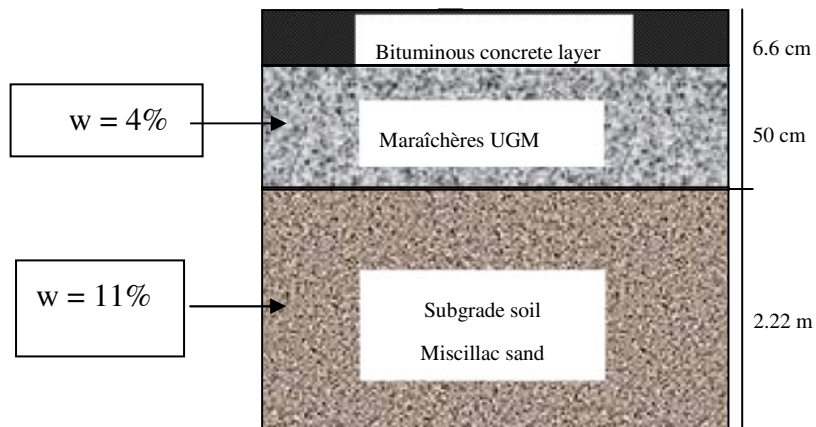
Low-traffic pavement studied with the LCPC pavement testing facility.
